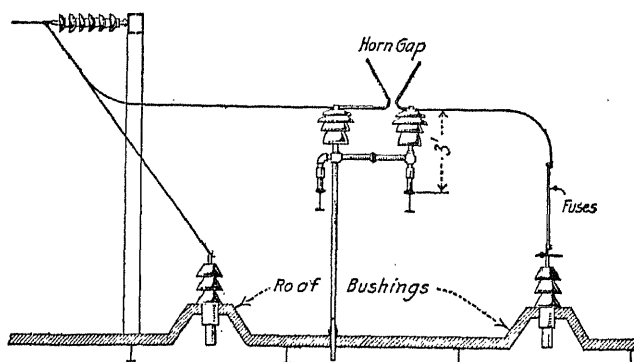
Roof Installation of Horn Gaps Operated from within Station and Connected Therewith through Roof Bushings
